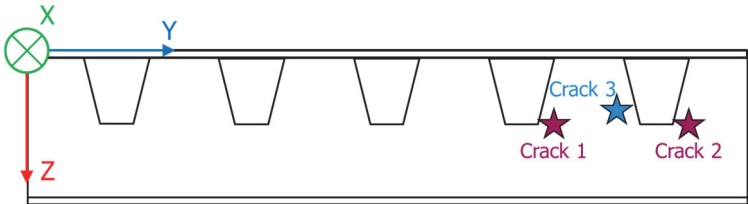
Schematic cross-section of bridge deck with locations of the fatigue cracks.
